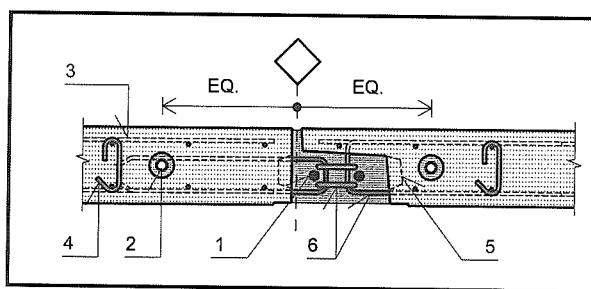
Wall-Wall Cast In-Situ Vertical Joint
